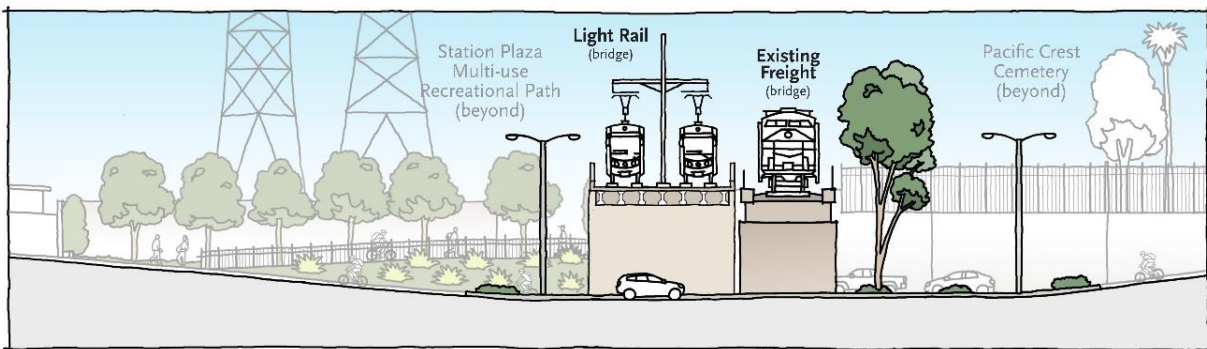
Locally Preferred Alternative – Looking South between Artesia Boulevard and Grant Avenue
